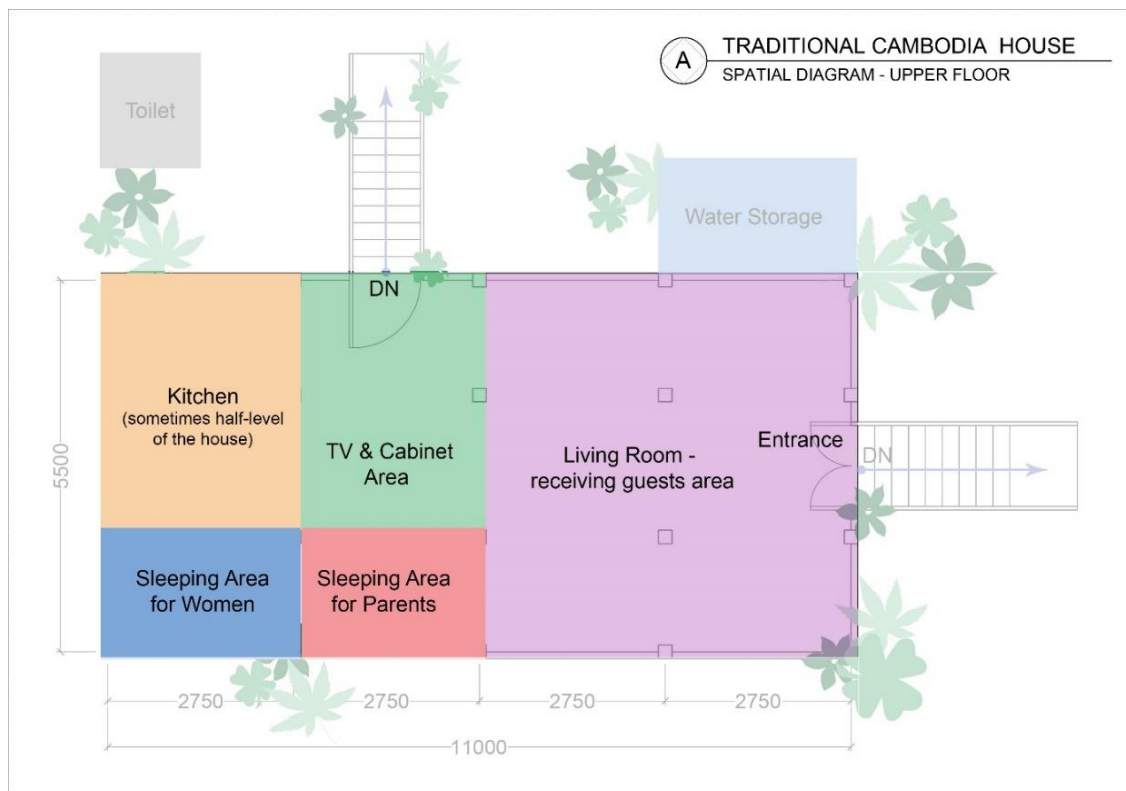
Spatial Diagram of Traditional Cambodian house – Upper Floor (Author)
